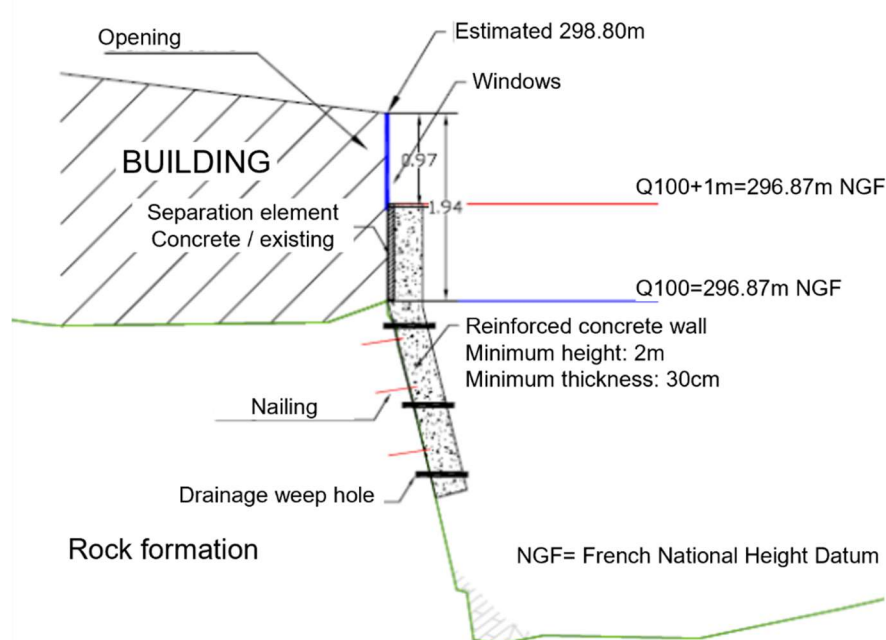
Diagram of reinforcement of a sprayed concrete consolidation (Source: ARTELIA)
